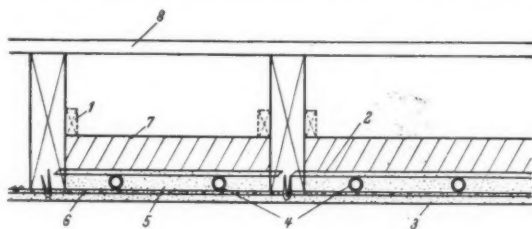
B.—System 5, embedded ceiling panels, showing method of laying pipes.
